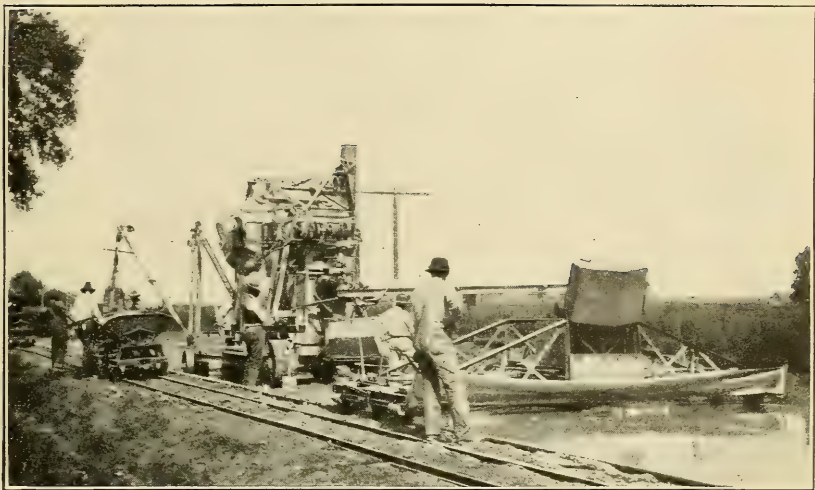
MIXING AND FINISHING THE CONCRETE.
